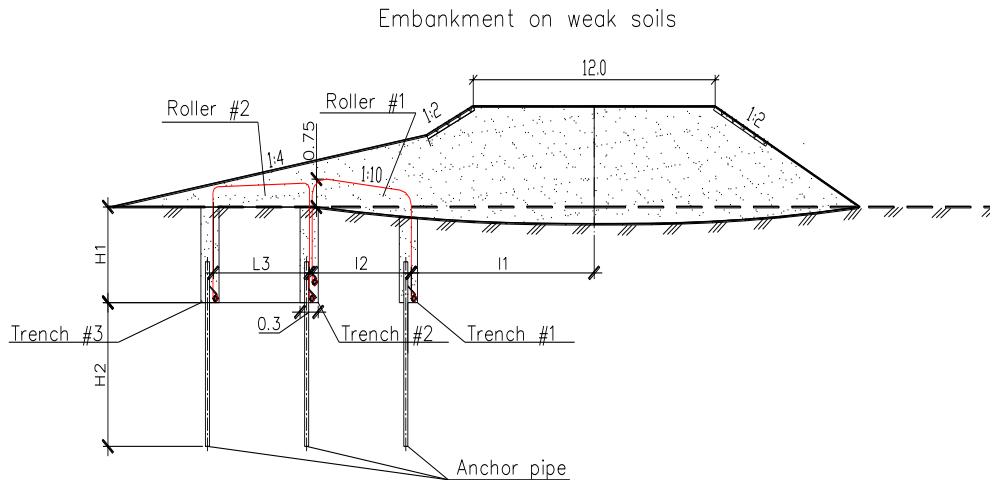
Constructional and technological solution for roadbed stabilization on road section №4 (PK 598+80 – PK 599+90).
